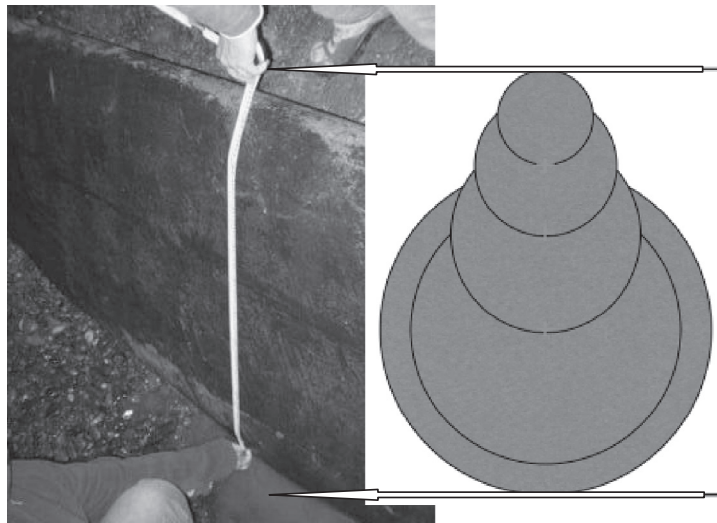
Width of collapsed pipe (1.2 m) is less than estimated height of the tunnel (1.4 m).
